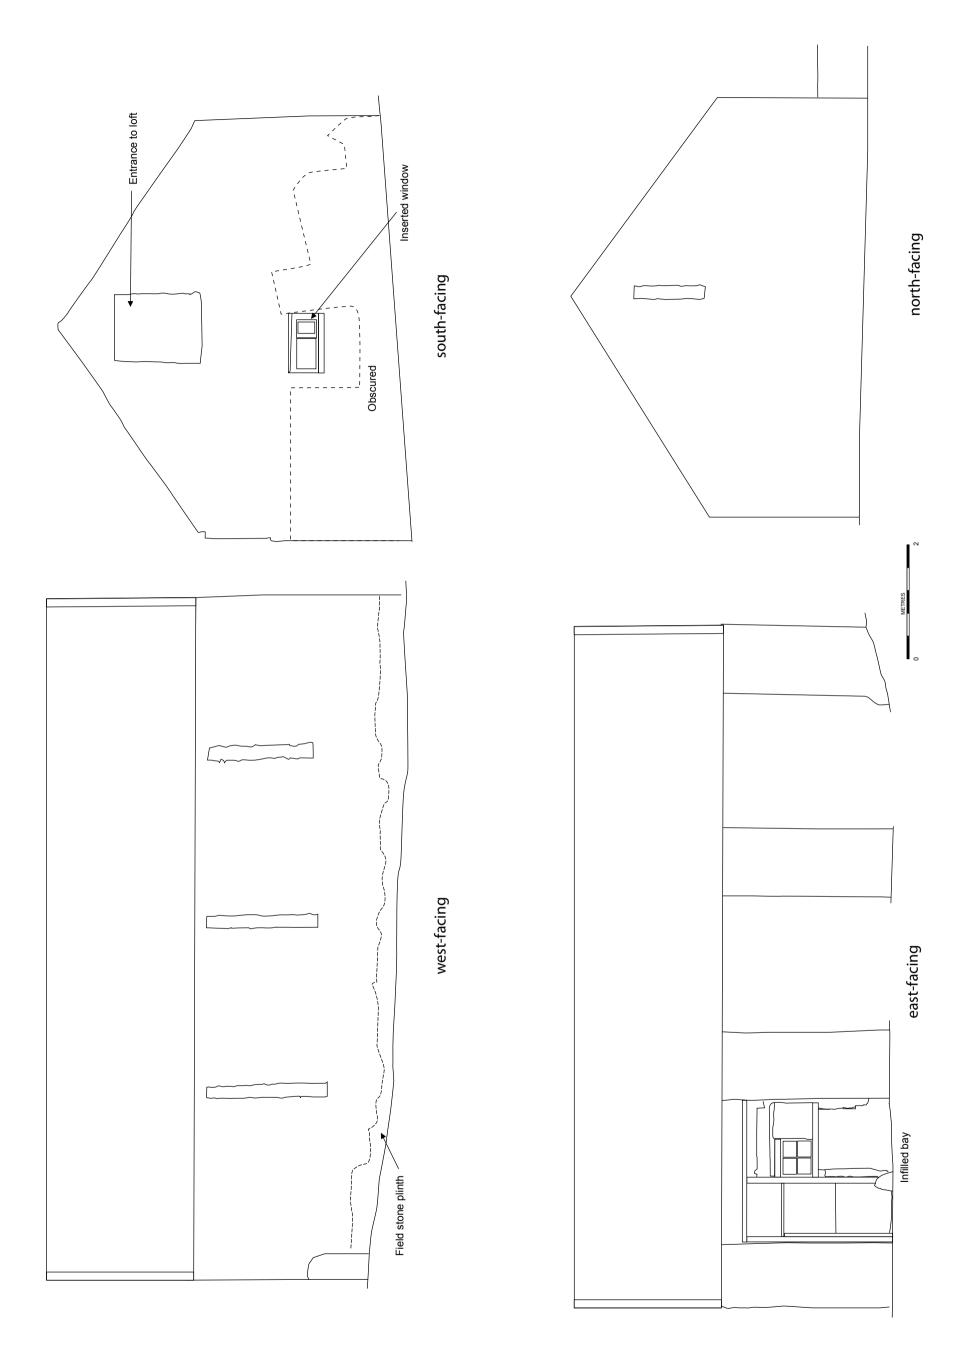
Site 10, Field barn Tal-y-Waenydd, elevations
